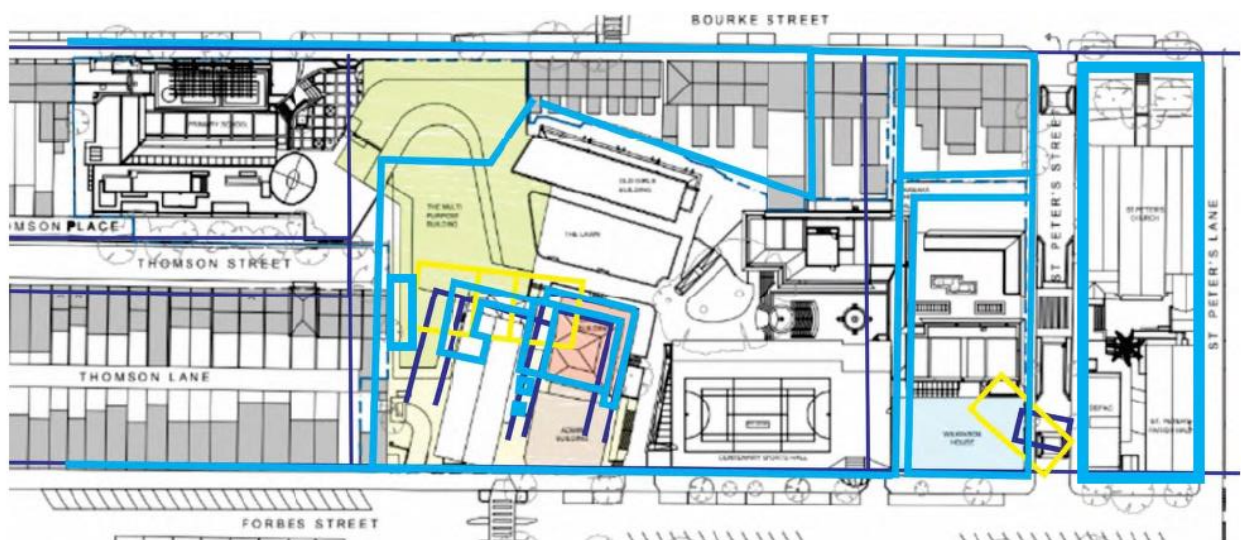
Overlay of Woolcott and Clarke's 1854 plan (yellow) and Dove's 1888 plan (blue) on masterplan. A series of outbuildings are located to the east of Barham and one of the stone cottages is located within the footprint of Wilkinson House.
